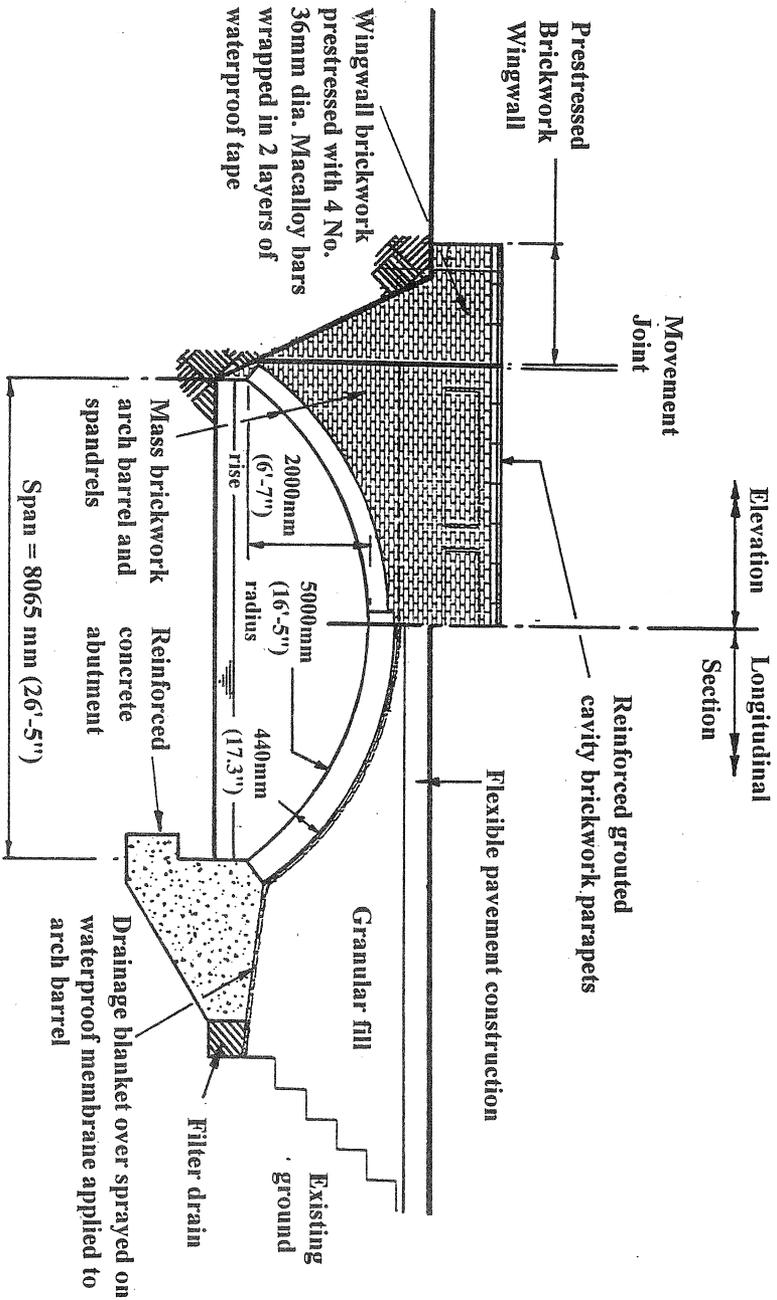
General Details - Kimbolton Butts Bridge, Cambridgeshire, England
